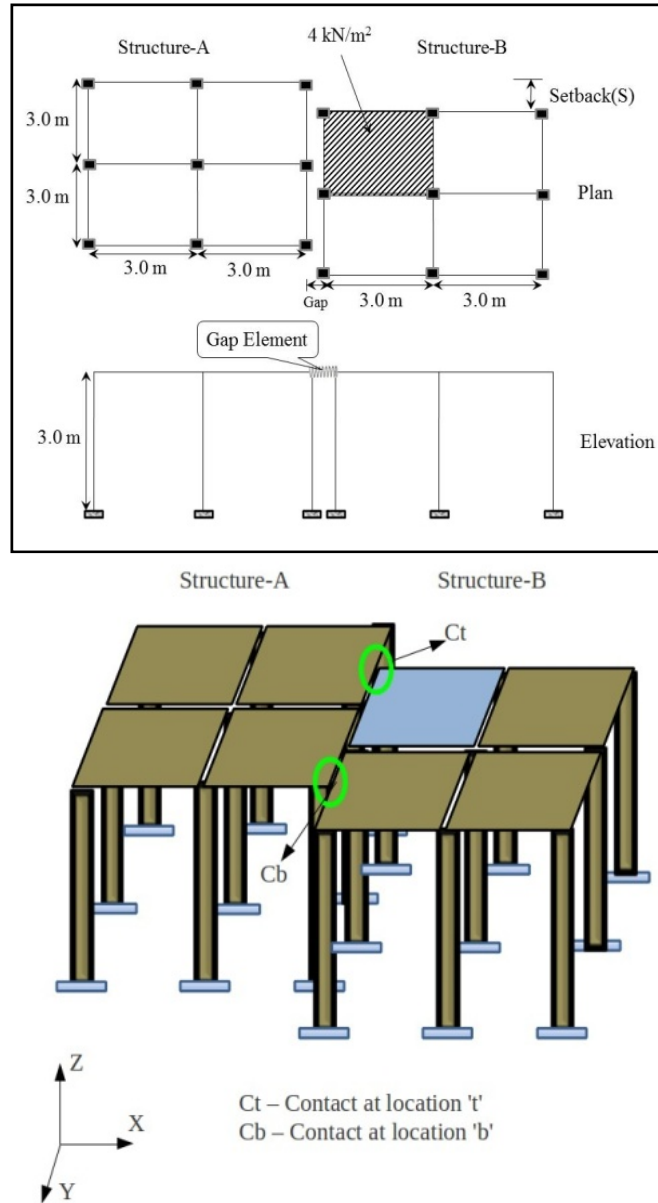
Plan and Elevation Views of Single Storey Symmetric and Asymmetric Structures
